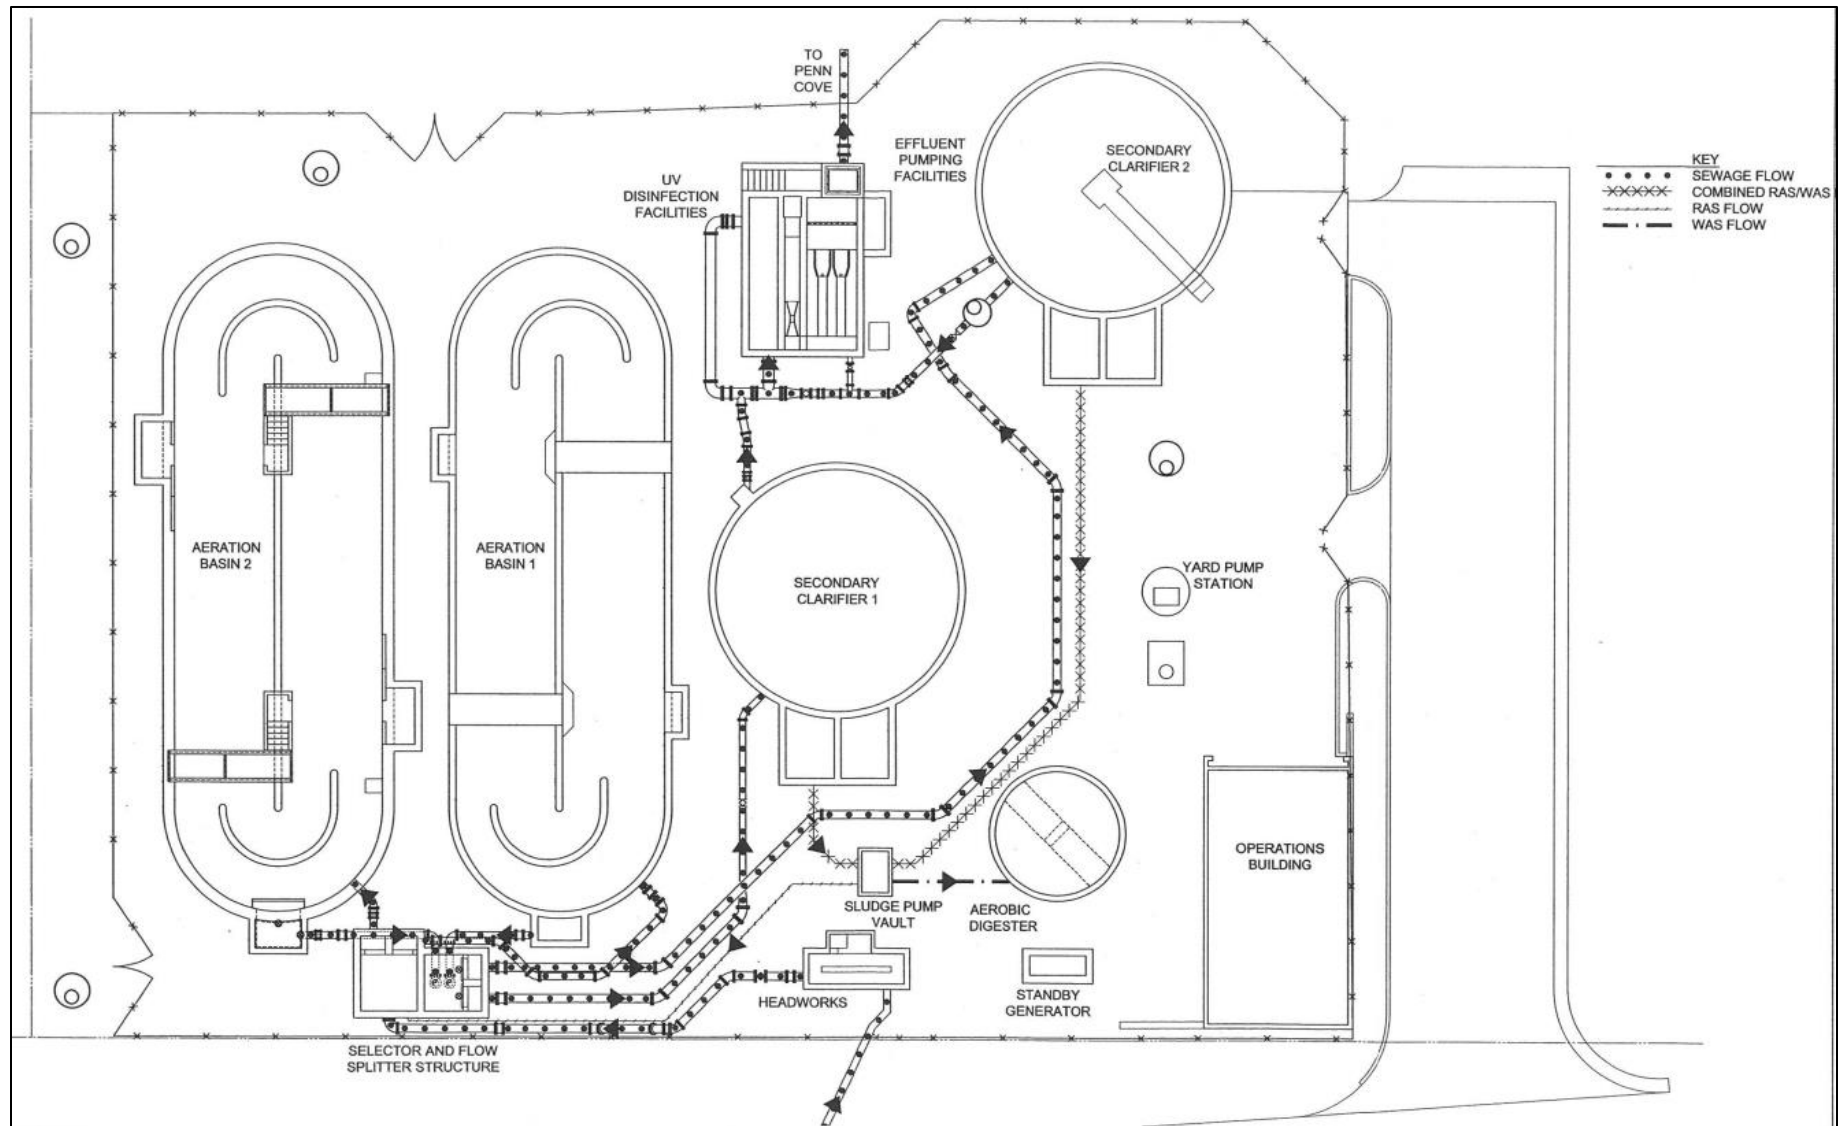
Coupeville Wastewater Treatment Plant Layout and Flow Diagram
